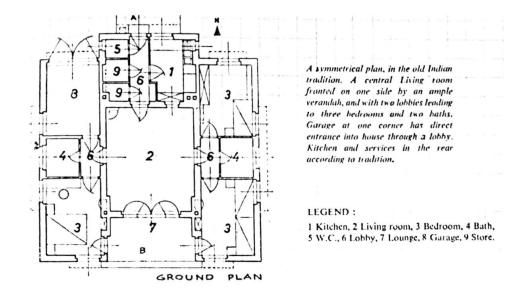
Proposed plan layout from 40 Designs for Low-cost Houses. Note the description used, highlighting "traditional" rear service spaces.
